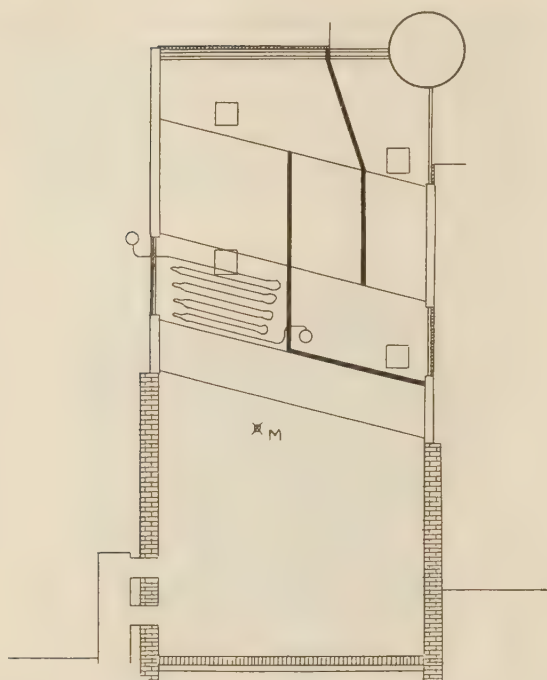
COMBINATION GAS- AND OIL-FIRED BOILER WITH ALL-REFRACTORY FURNACE
